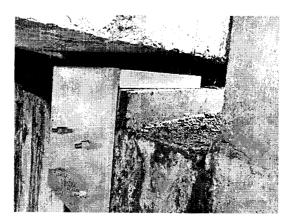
Complete Installation and Fabrication of New Elastomeric Bearing Pad
